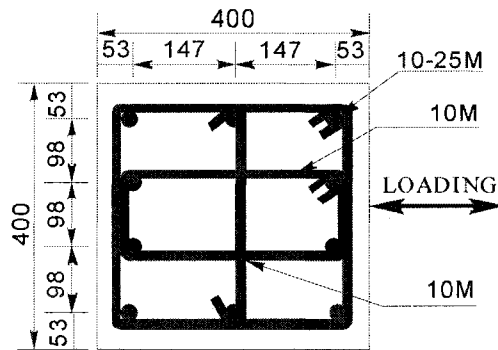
Internal transverse reinforcement detail for specimens CV0A and CV0B (plan)
